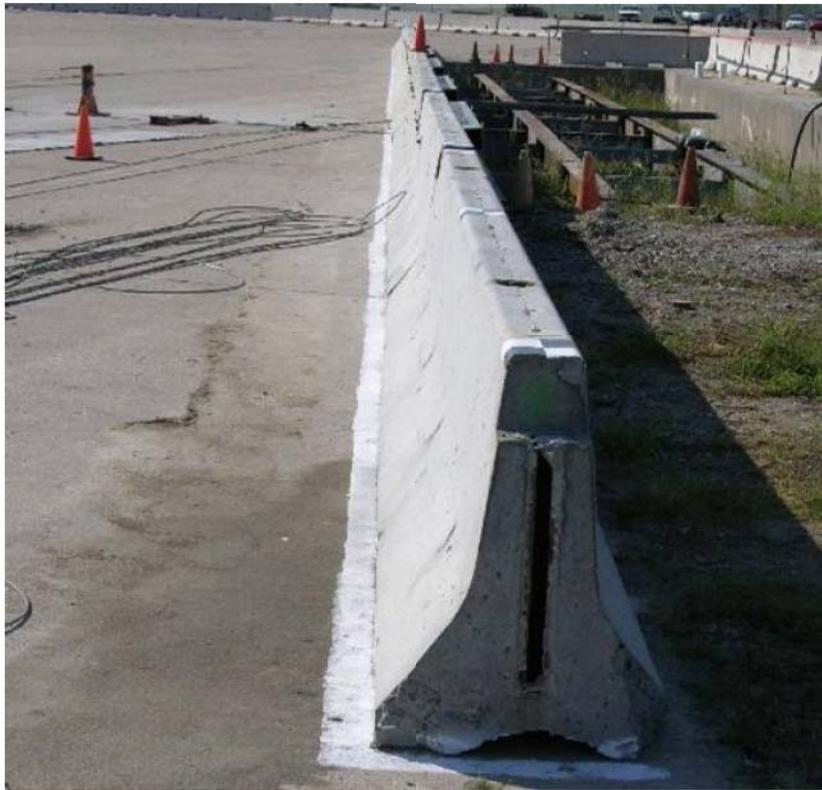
Box Beam Stiffened Temporary Concrete Barrier System, Test NYTCB-3
